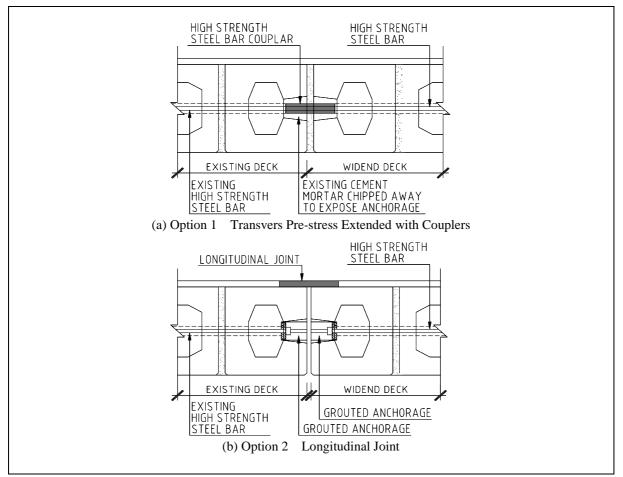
Deck Widening Connection Details for Full 4-Lane
